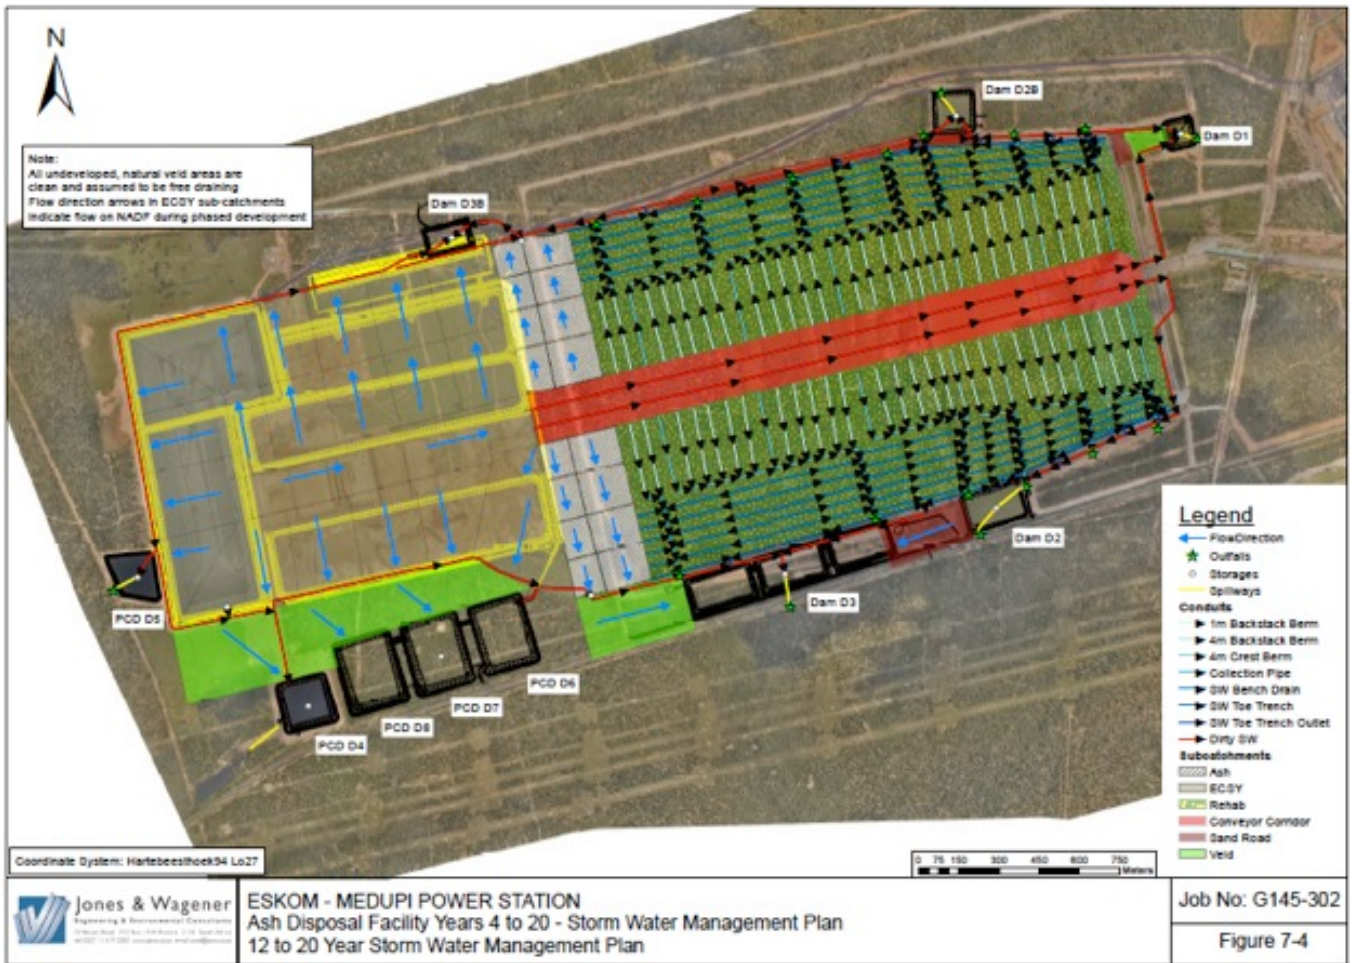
Existing and licensed ADF as well as the associated dams and proposed storm was management plan
